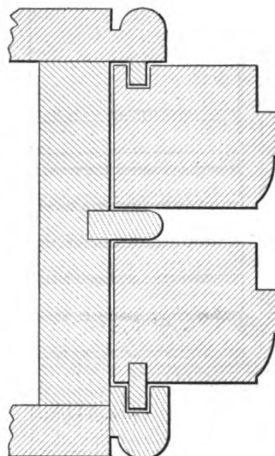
Section Showing Arrangement of Top and Bottom Sash.
